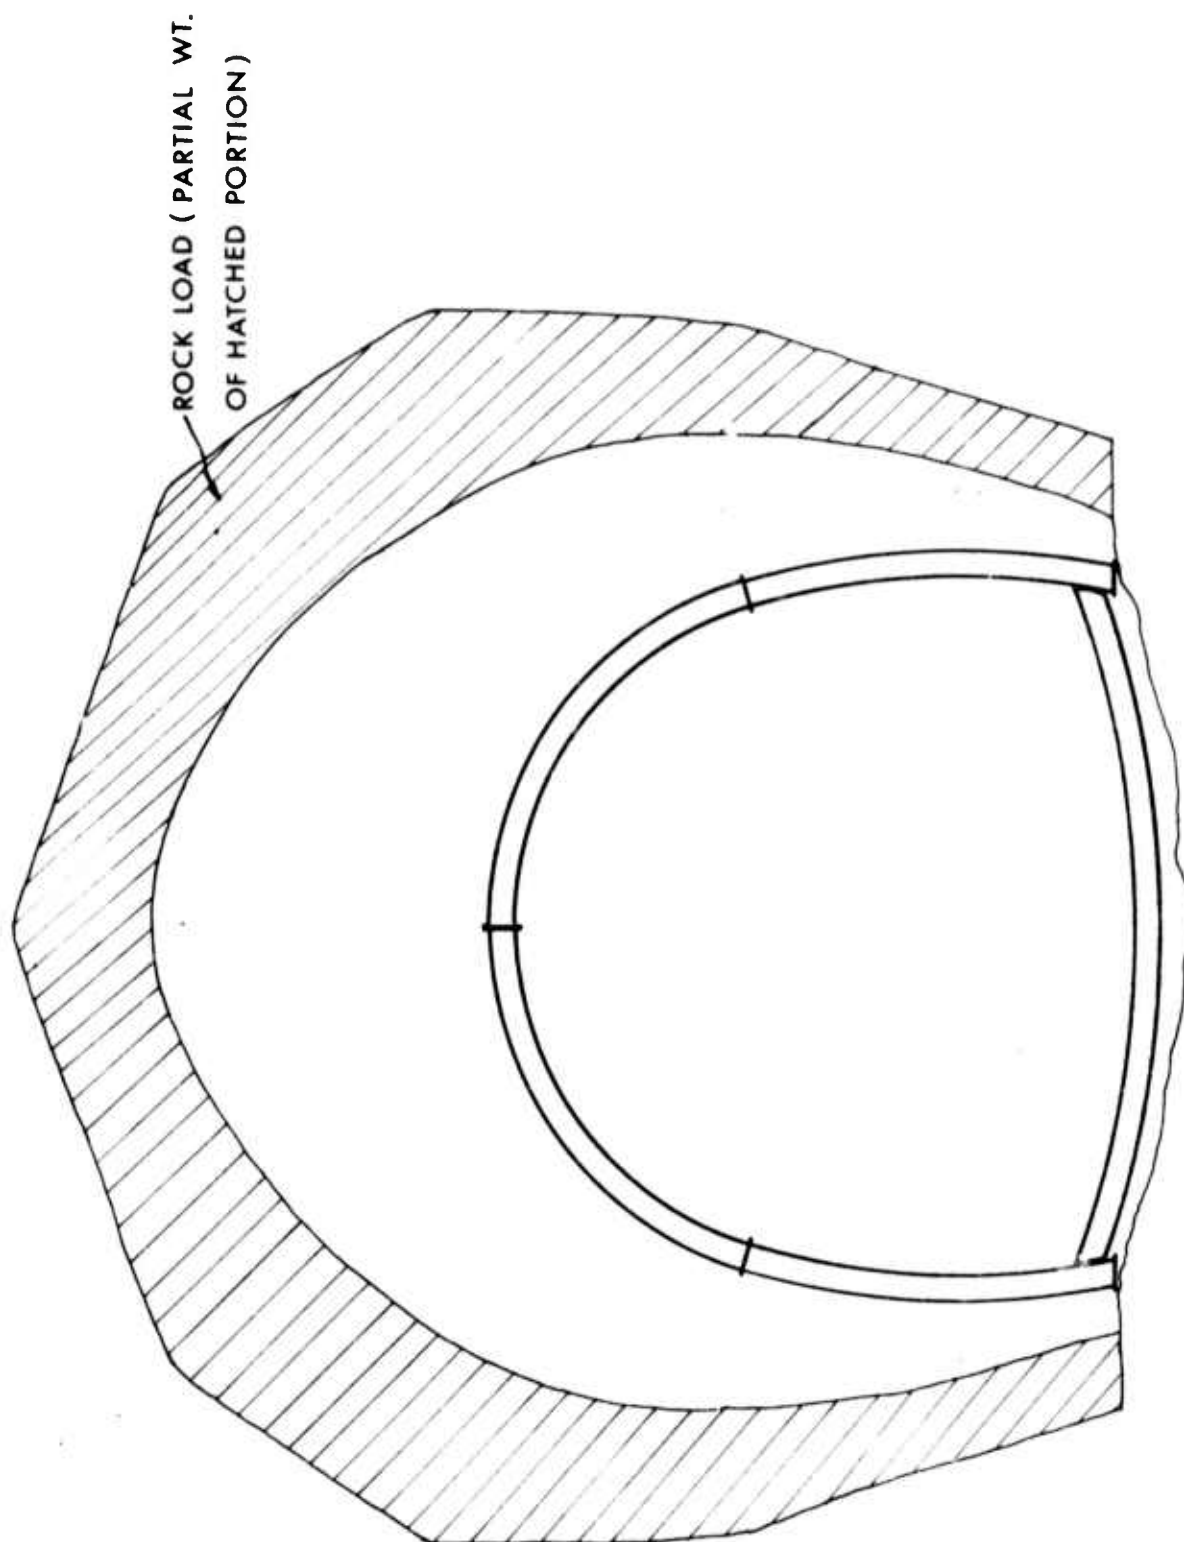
Tunnel Cross-Section Showing Rock Load for Case b
